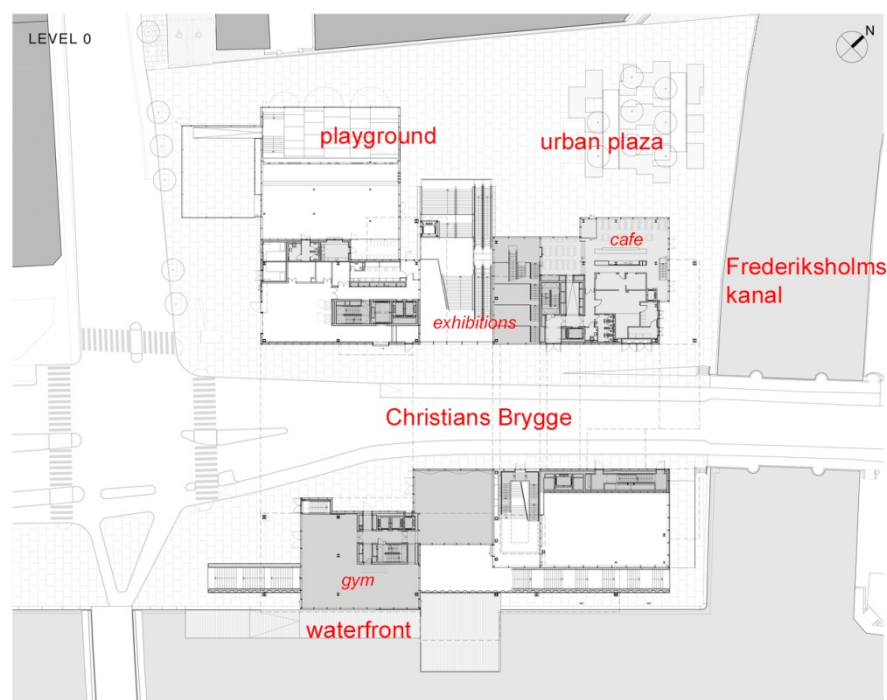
BLOX/DAC. Ground floor plan [drawing by OMA; found at (Archdaily, 2018)].
